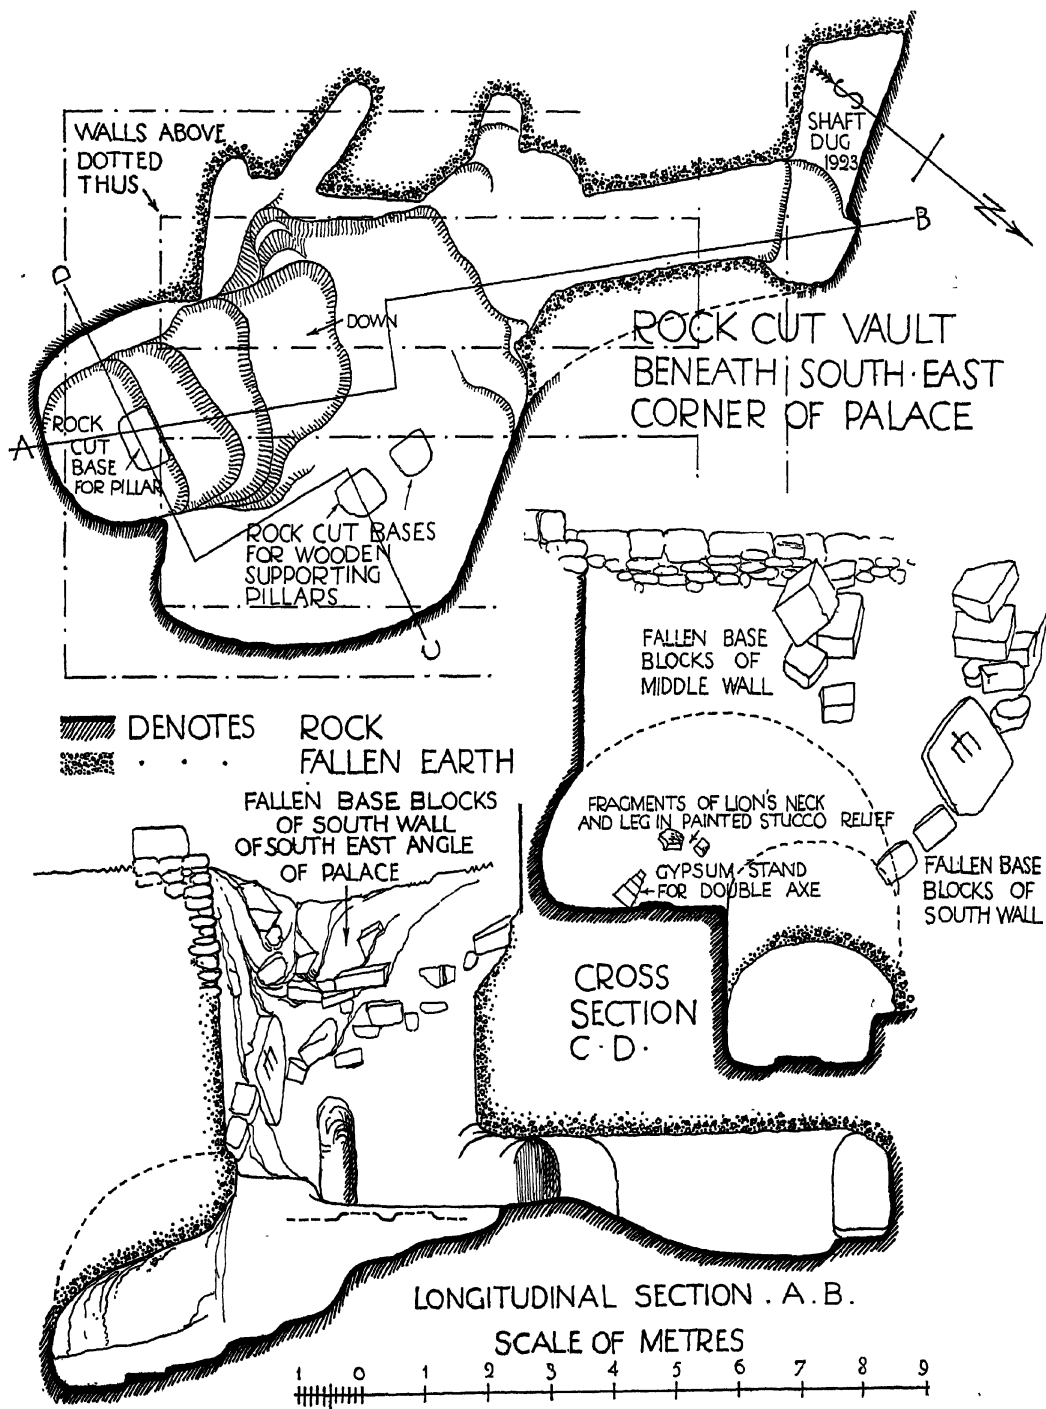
PLAN AND SECTION OF ARTIFICIAL VAULT BENEATH SOUTH-EAST PALACE ANGLE.
